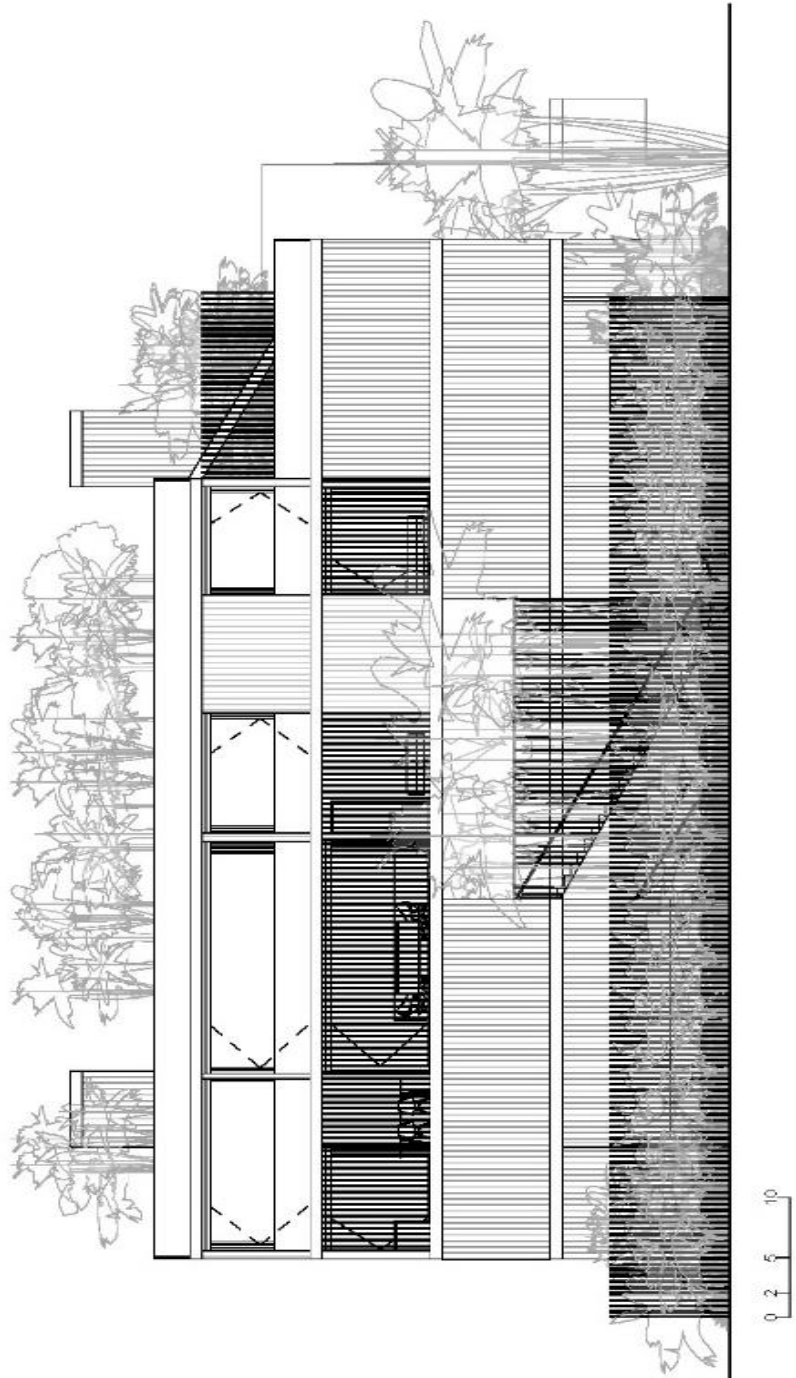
Project B, *Mauka Elevation*. Scale: 1/16" = 1'0"
